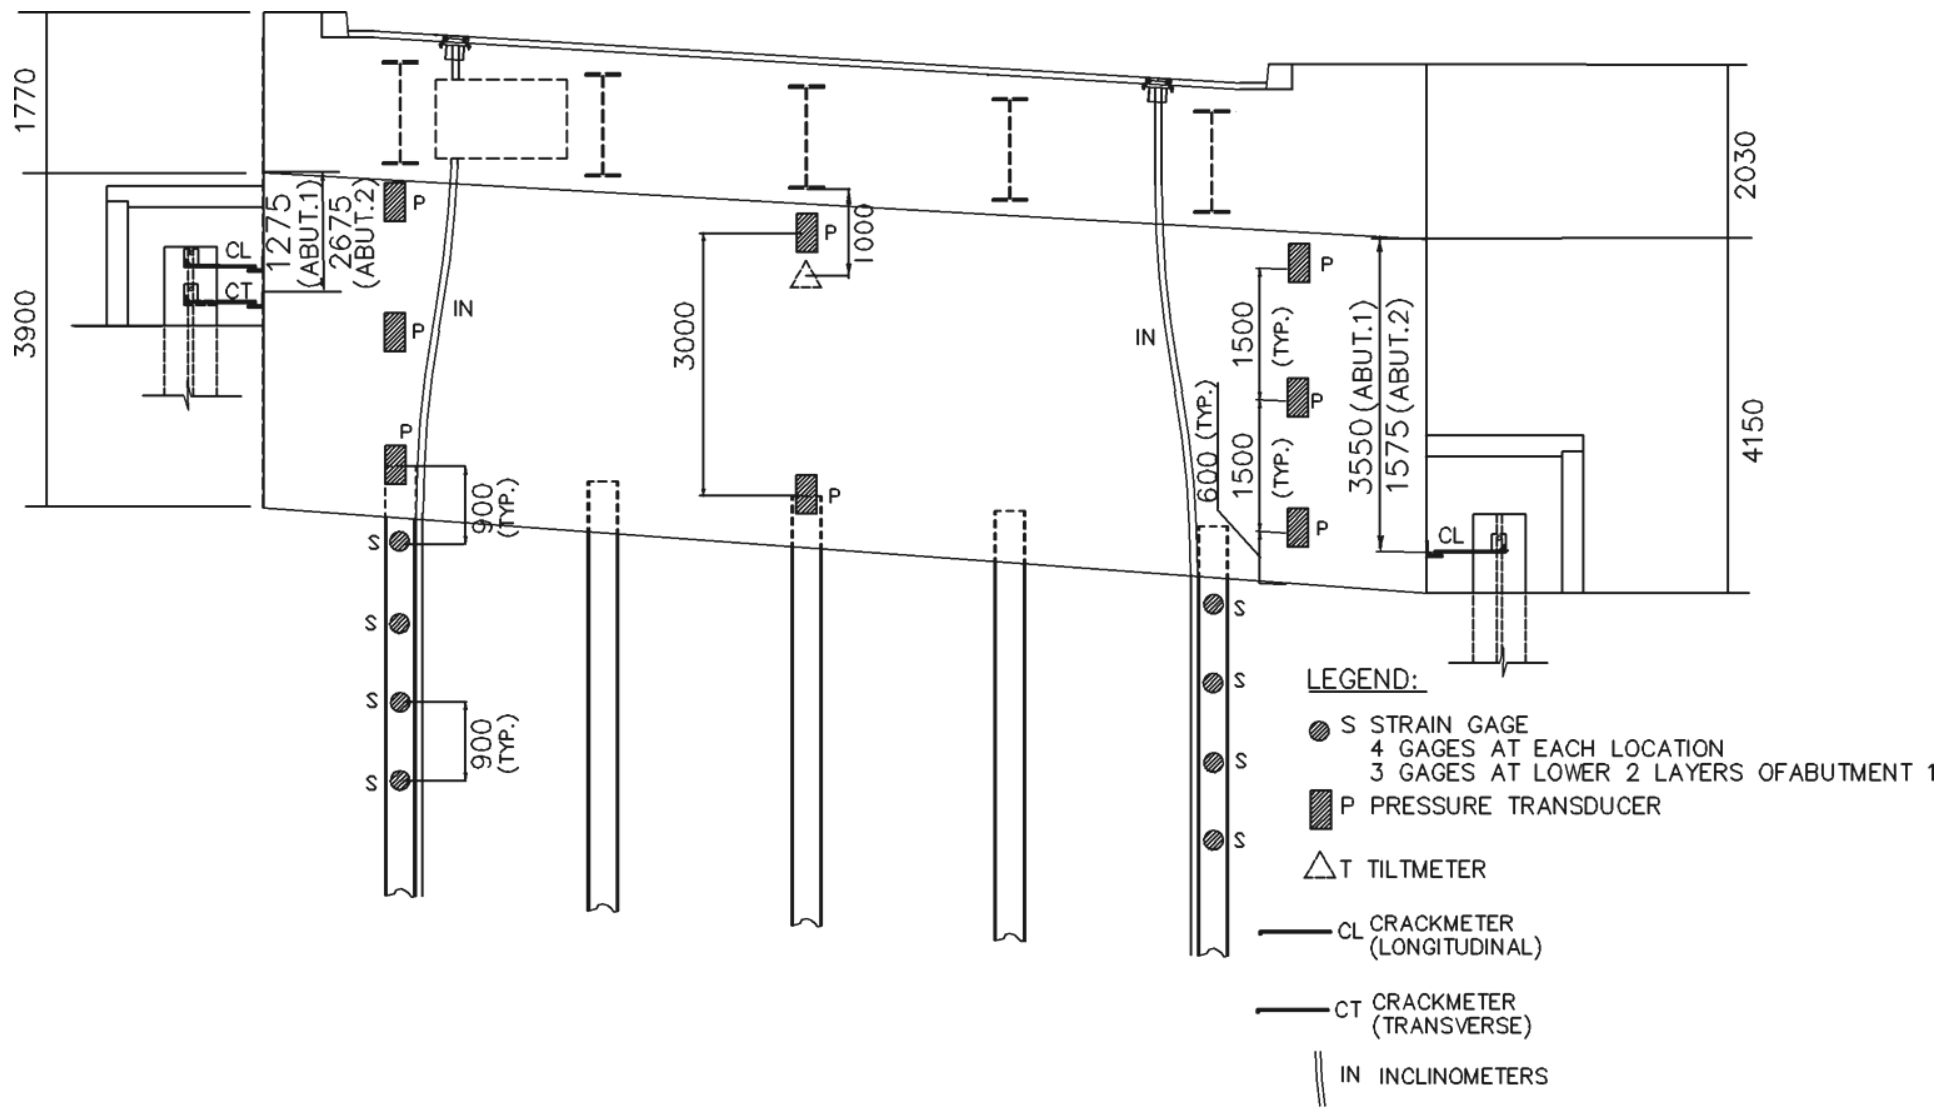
Abutment Instrumentation at Stockbridge Bridge
